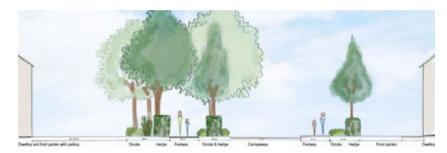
Sketch section of landscape buffer planting along east-west sections of road
